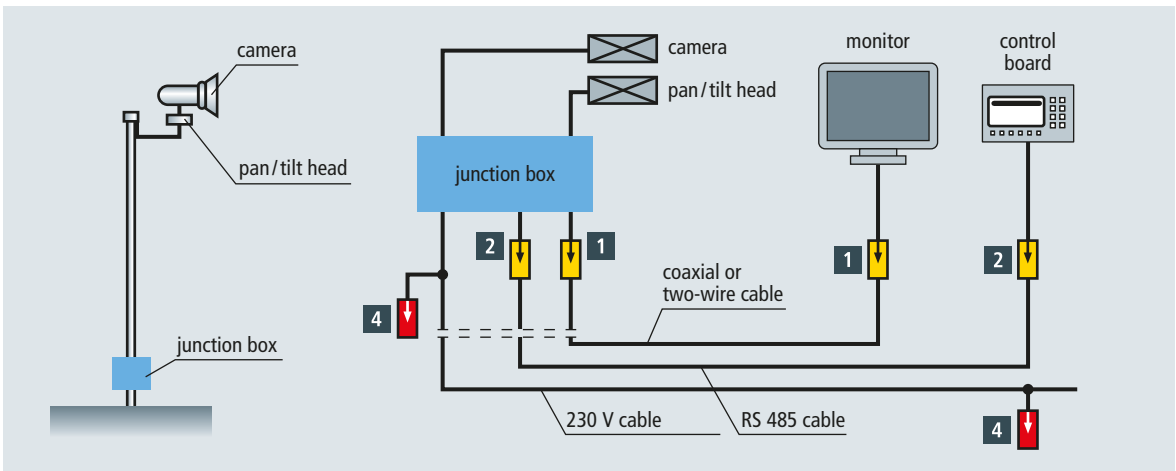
Camera connected to a building without external lightning protection system with surge protective devices on both ends
